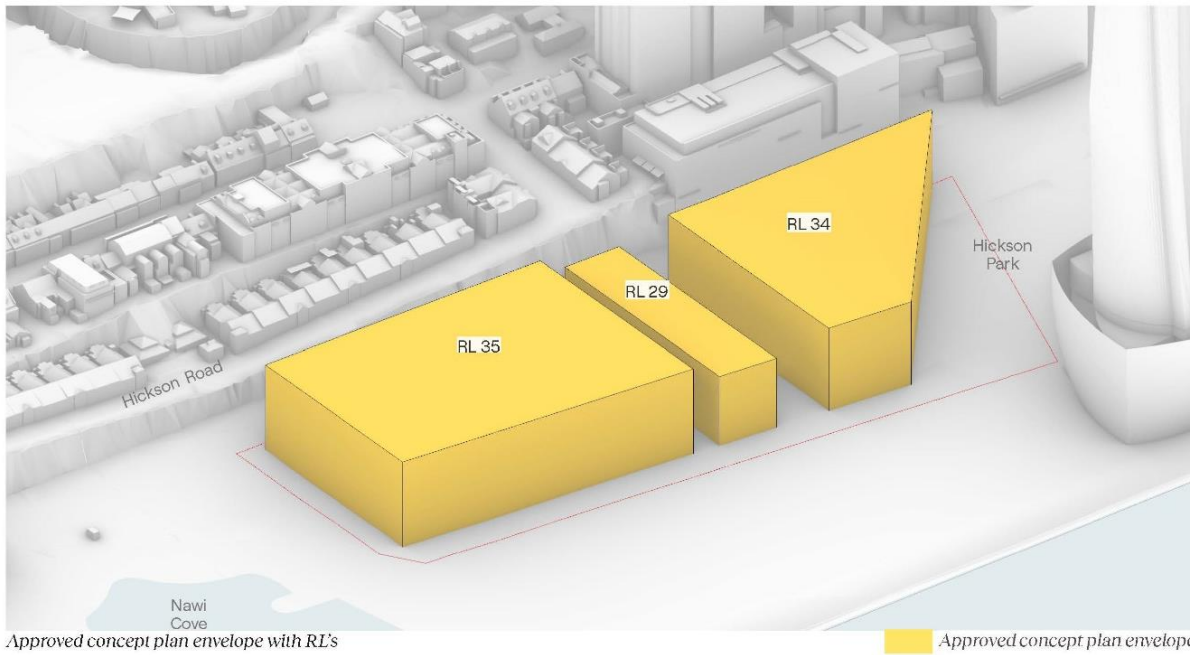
The 2007 approved concept plan showing building envelope and RLs. The design principles for the concept plan stipulated height modulation within the block envelopes. (Source: SJB 2023)
